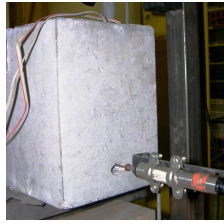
Horizontal transducer at the end face of the C2 beam series.
